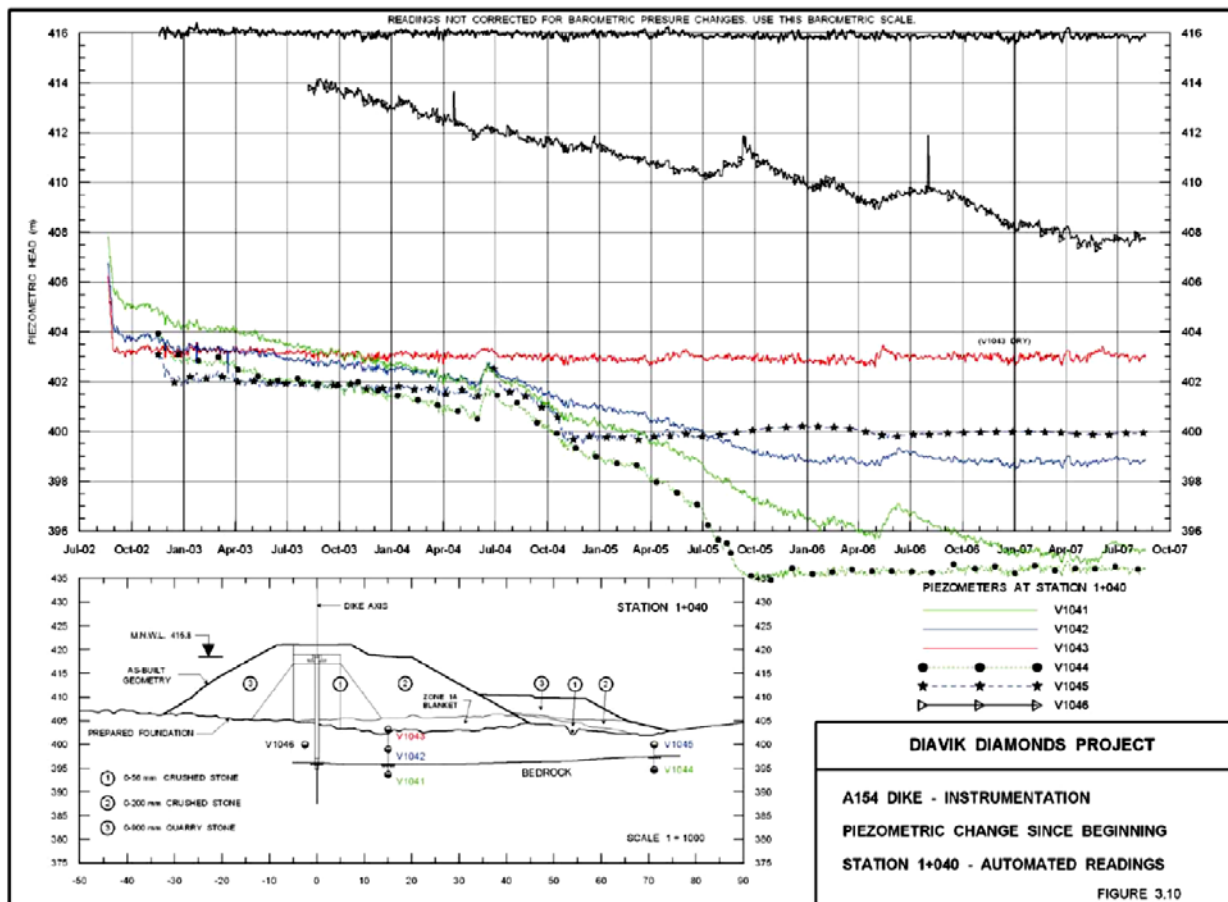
Piezometer readings at cross section 1+040 (A154).
